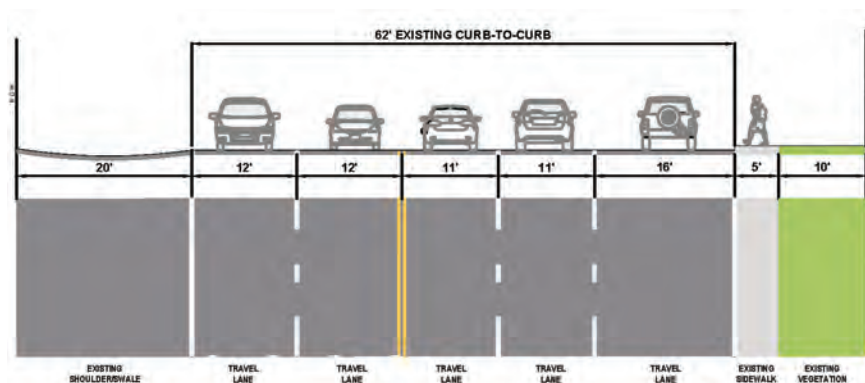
San Bruno Ave Existing Typical Section From US 101 To McDonnell Road (Facing East)
